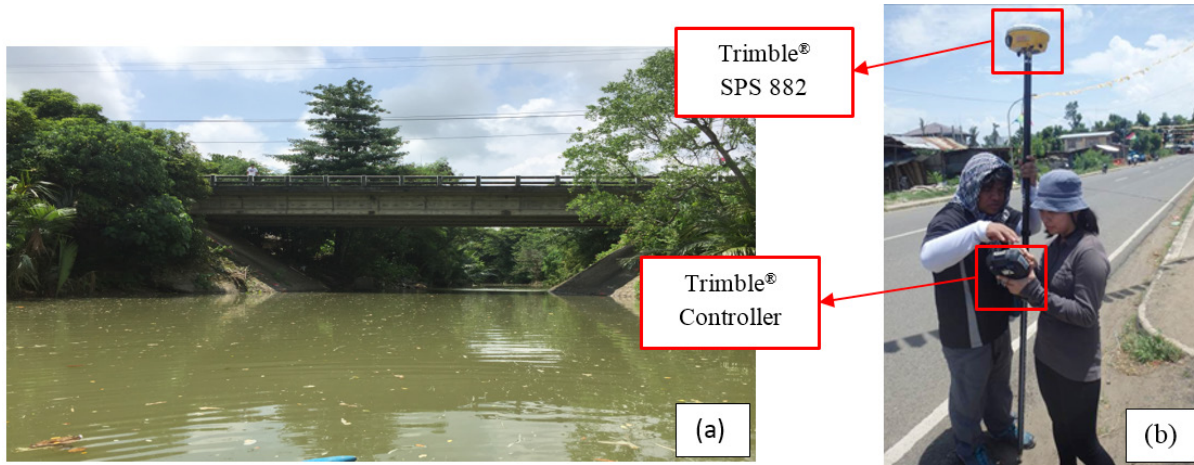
(a) Panoramic View of the Balasan Bridge facing upstream; and (b) as-built and cross section survey of the Balasan Bridge
